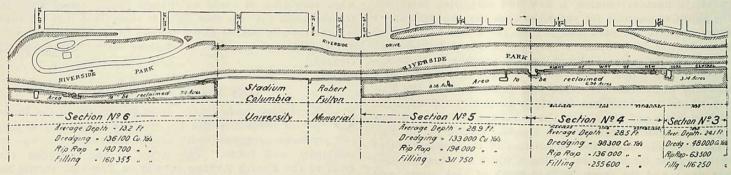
NORTHERN HALF OF THE AREA TO BE RECLAIMED.
